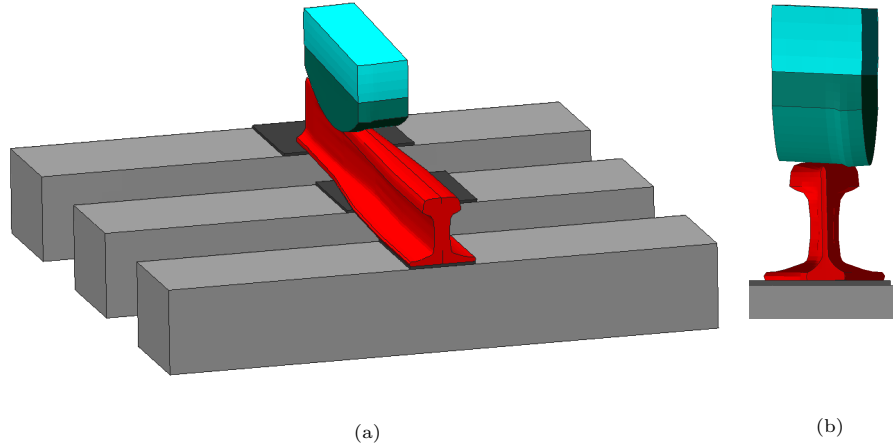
Load application at the crossing element model: a) general view and b) section view.
